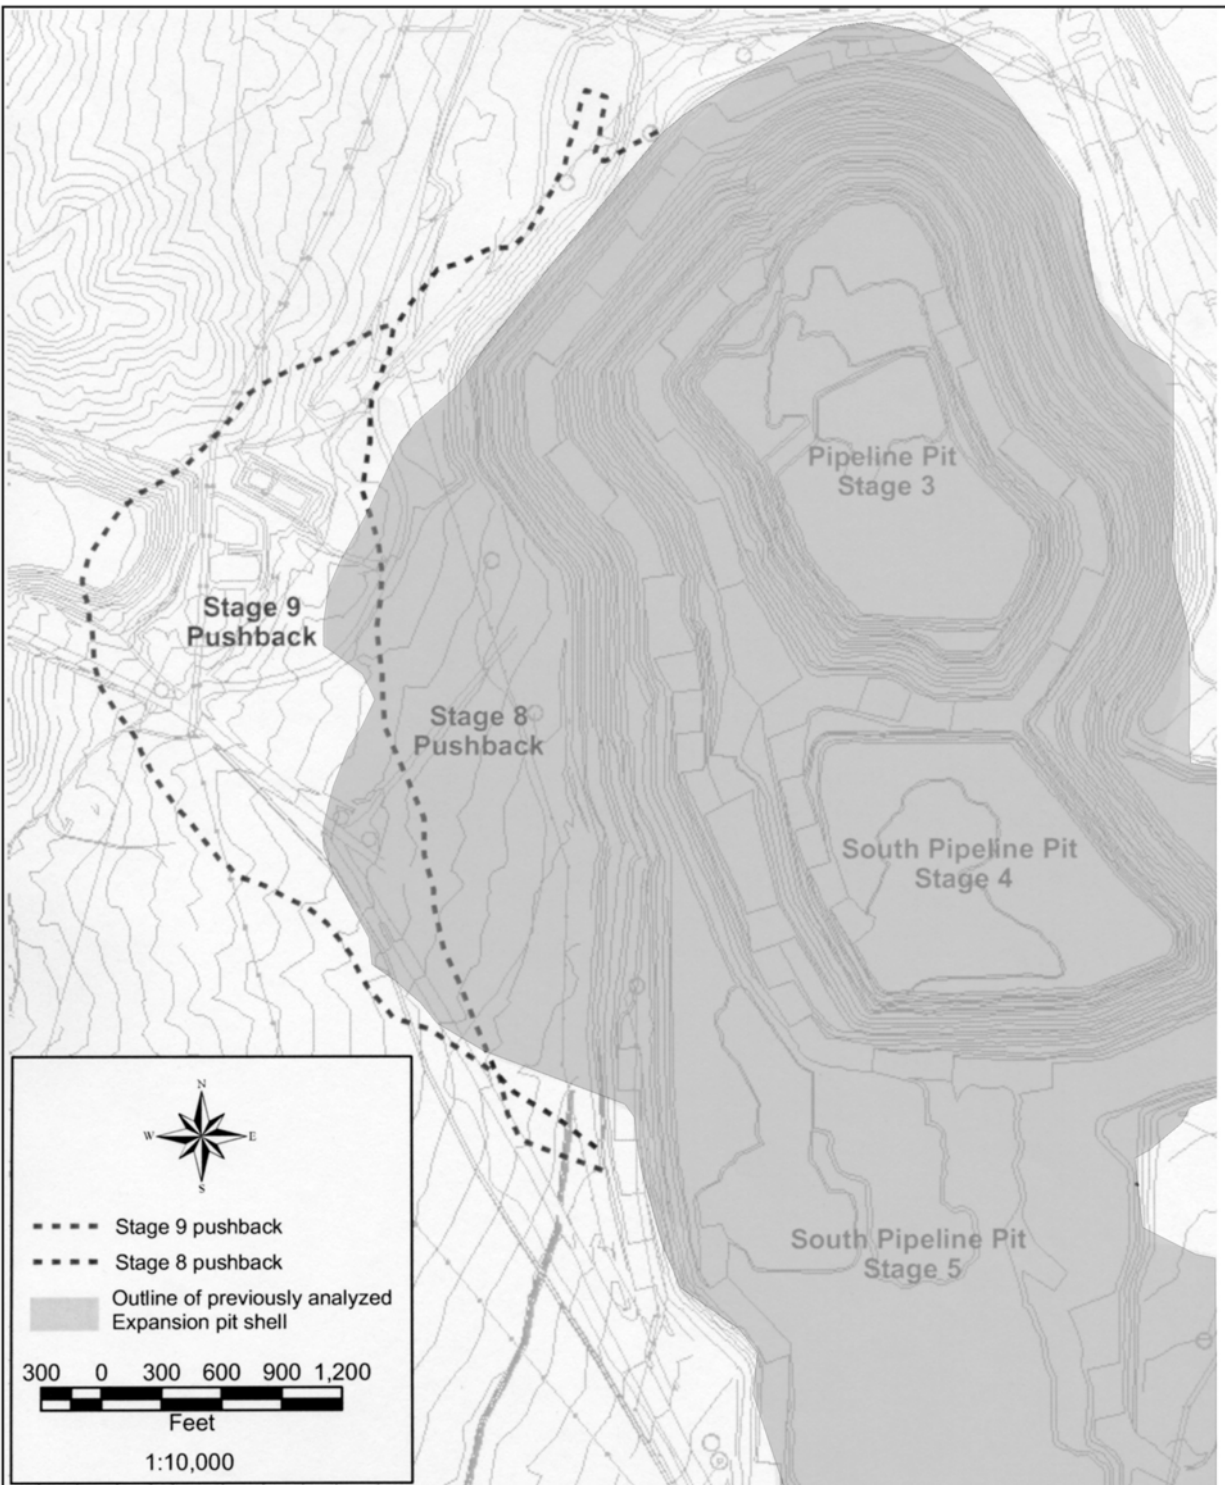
Stages 8 and 9 Plan View of Open Pit West Rim Revision
